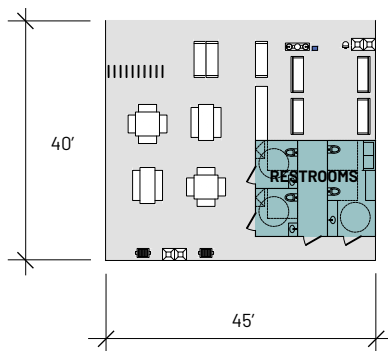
The plan of the Rest Pavilion (Tier II) example at river mile 50.9 shows how access is provided to the LA River multiuse trail and how stormwater can be treated prior to entering the LA River.
